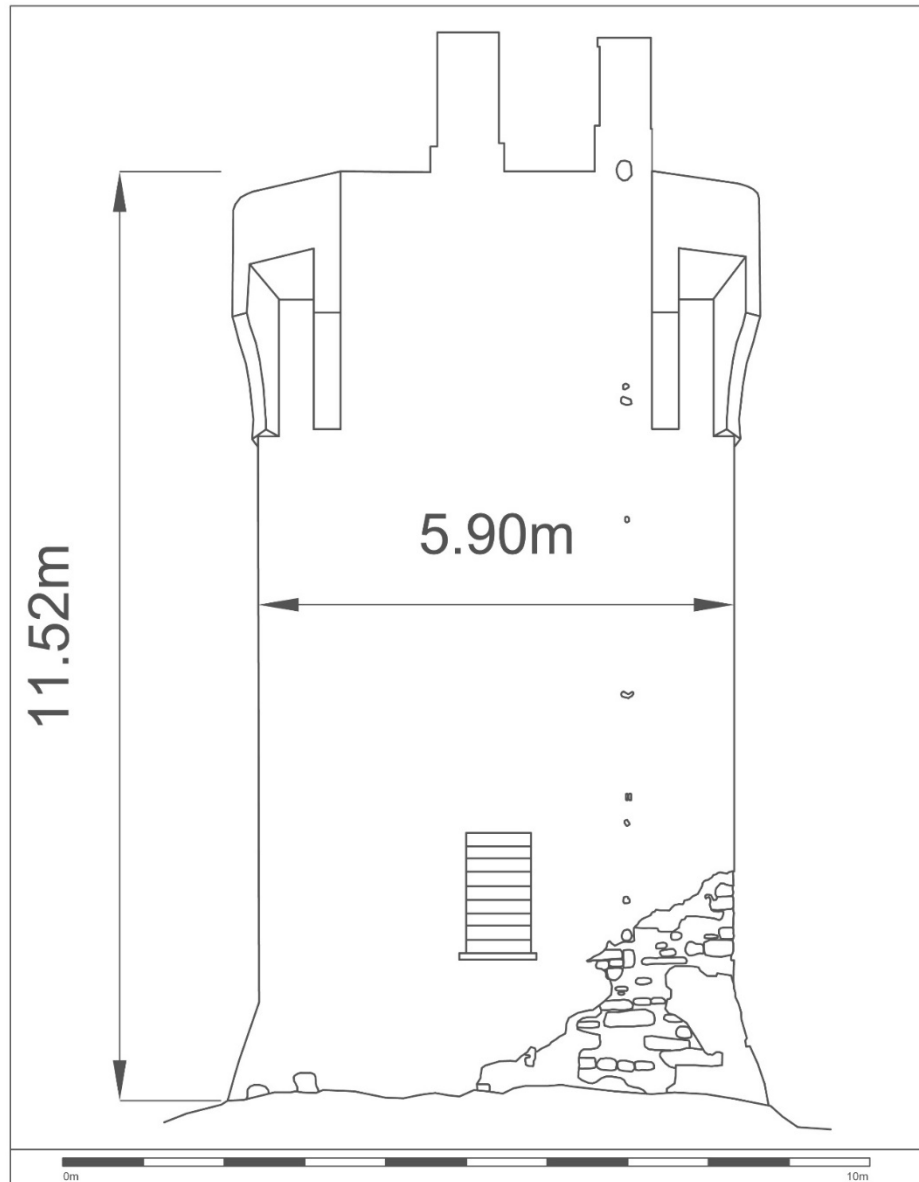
External elevation of the south-east wall of the heavily modified signal tower at Malin Head Signal Station.
